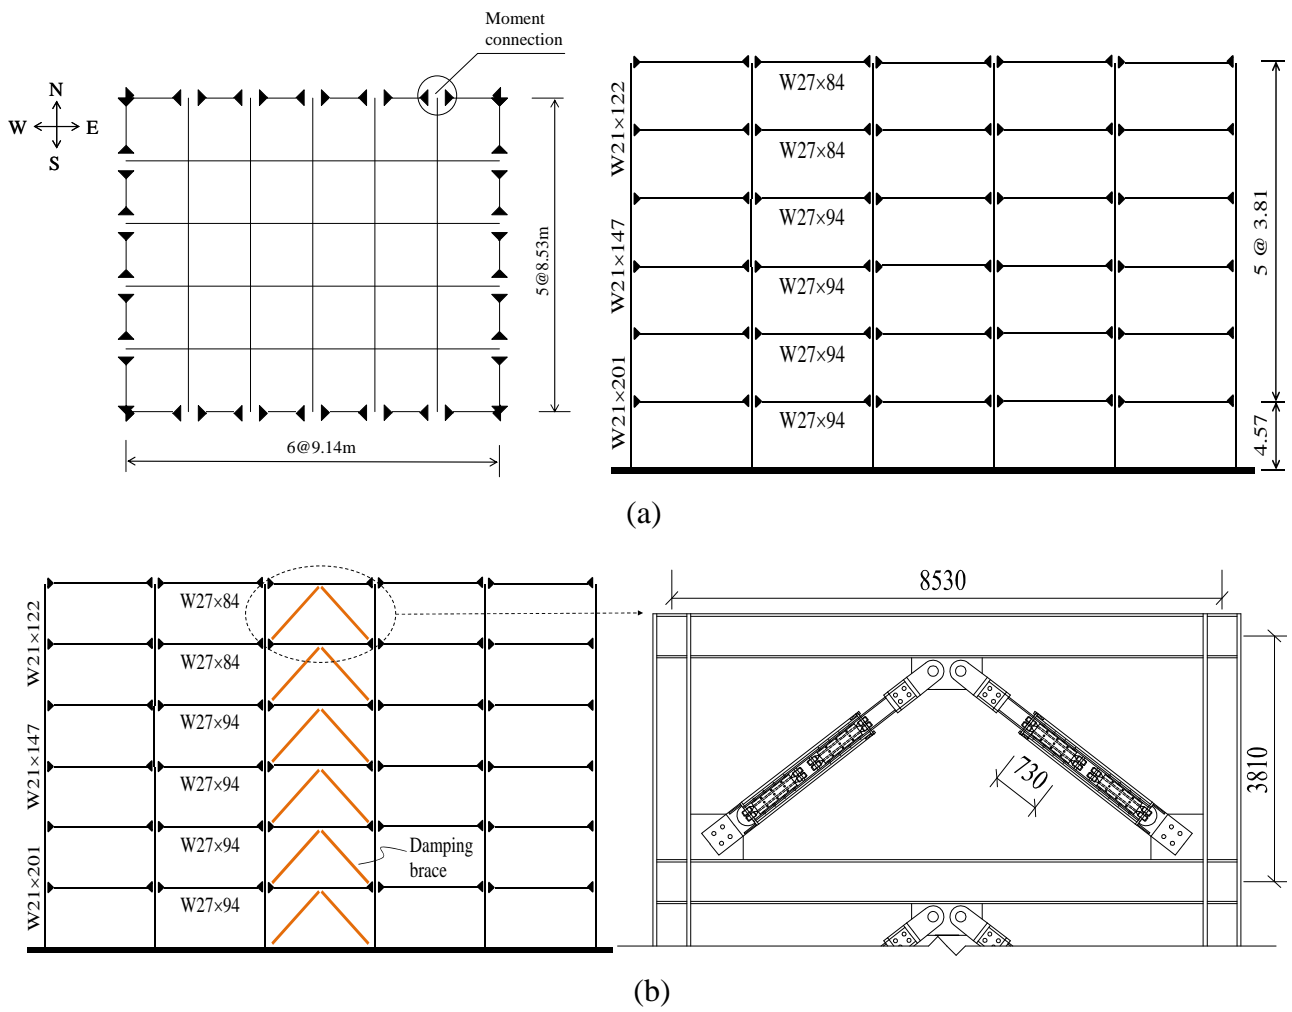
Considered frame buildings: (a) plain layout and elevation view of original prototype frame, (b) retrofitted braced frame
